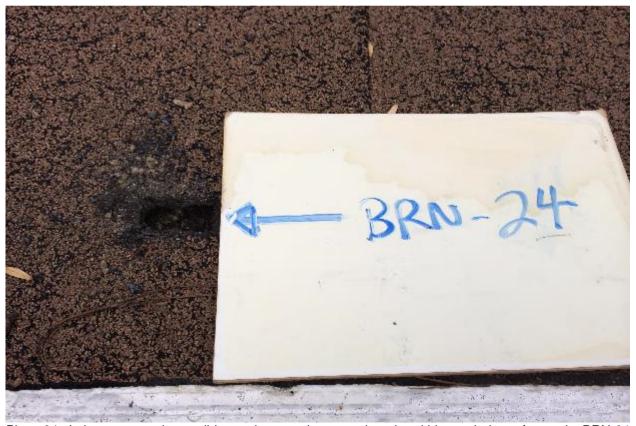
Laboratory analyses did not detect asbestos minerals within asphalt roof sample BRN-24 collected from the South Administrative Building roof.
